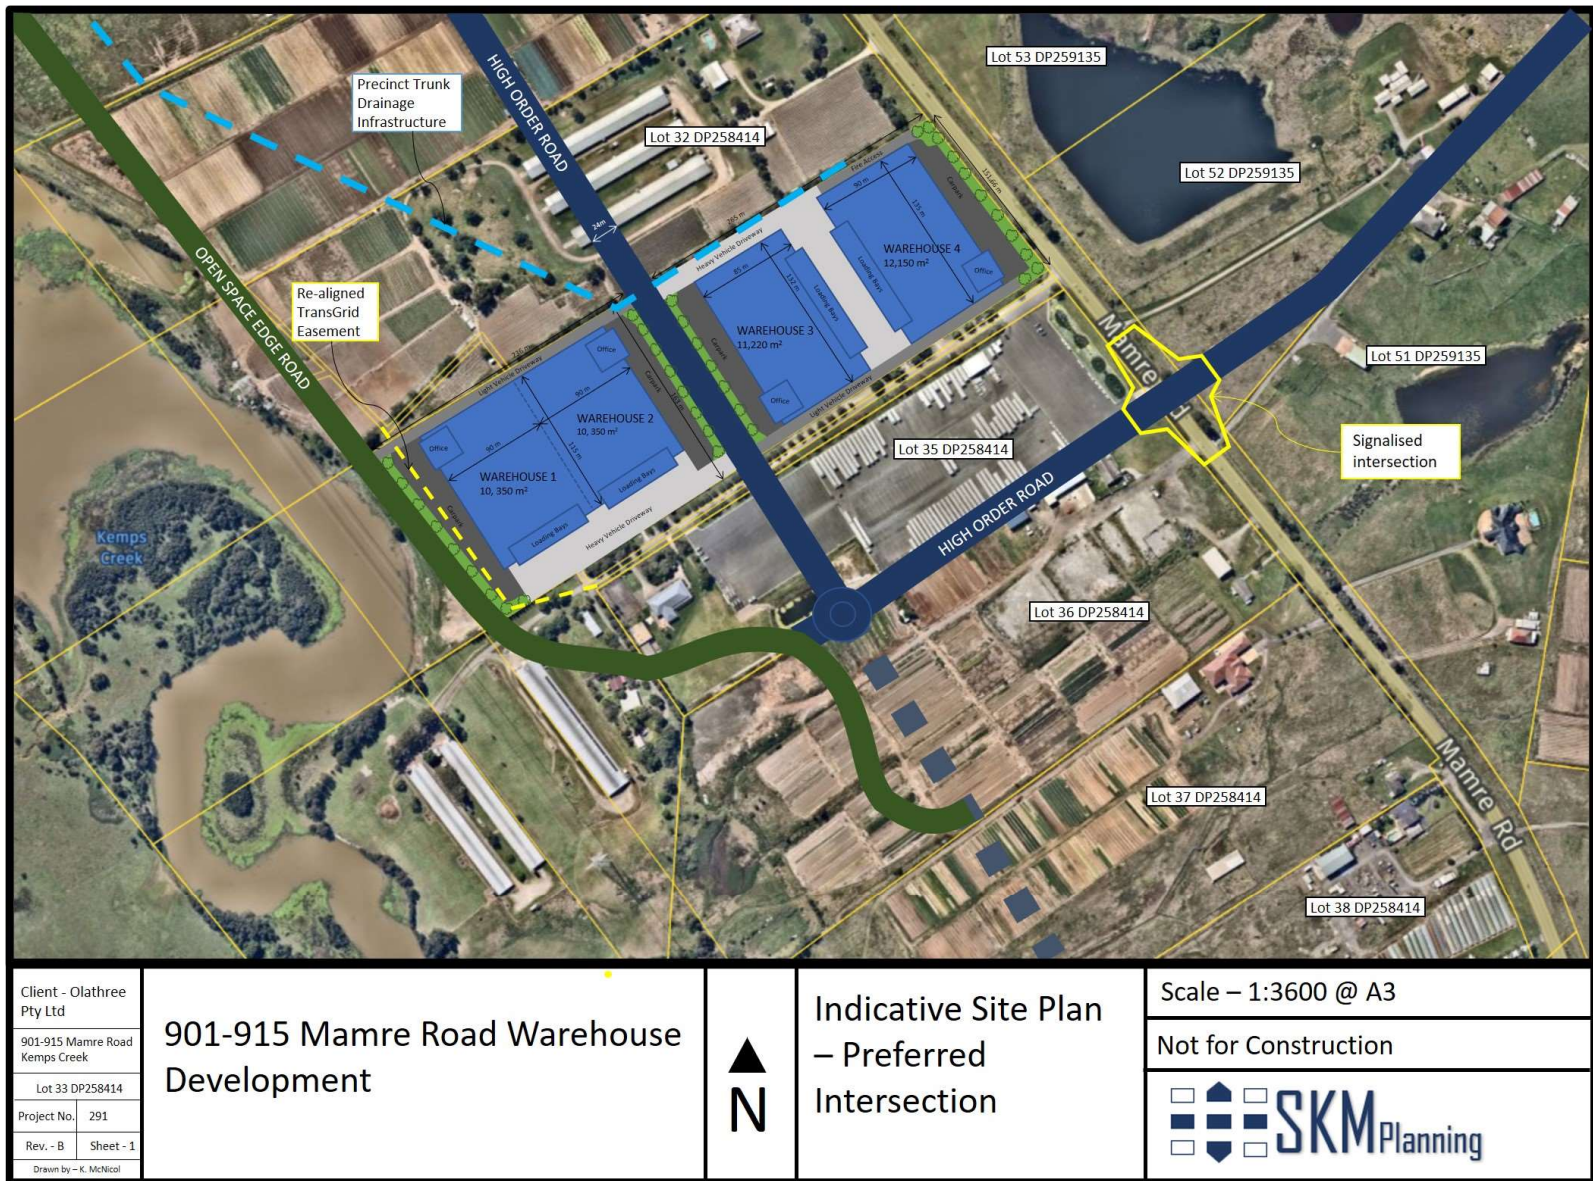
Indicative Site Layout - 901-915 Mamre Road, Kemps Creek
